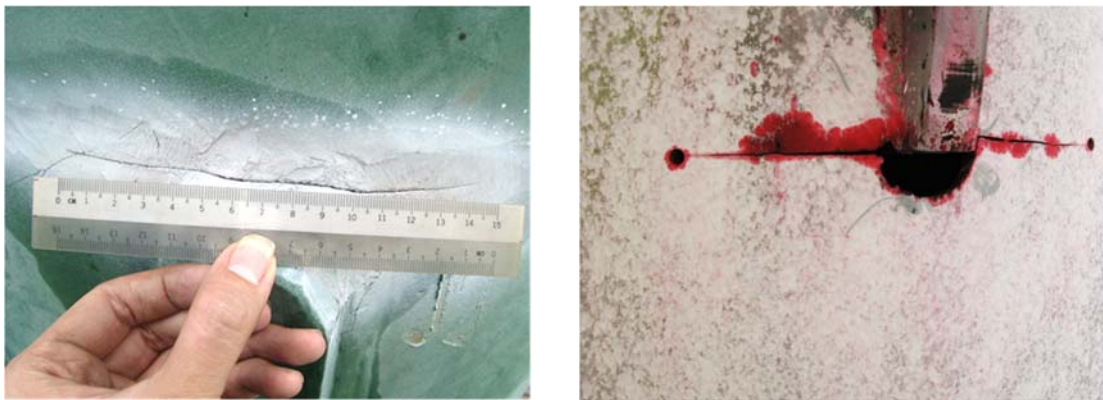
Fatigue cracks nearing fracture critical length, initiating at end of seal plate (left) and at poor fabrication cut of relief hole (right)
